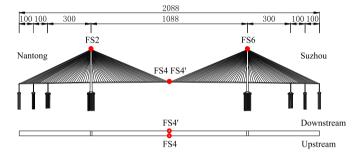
Layout of the anemometers on Sutong Bridge (Unit: m).
